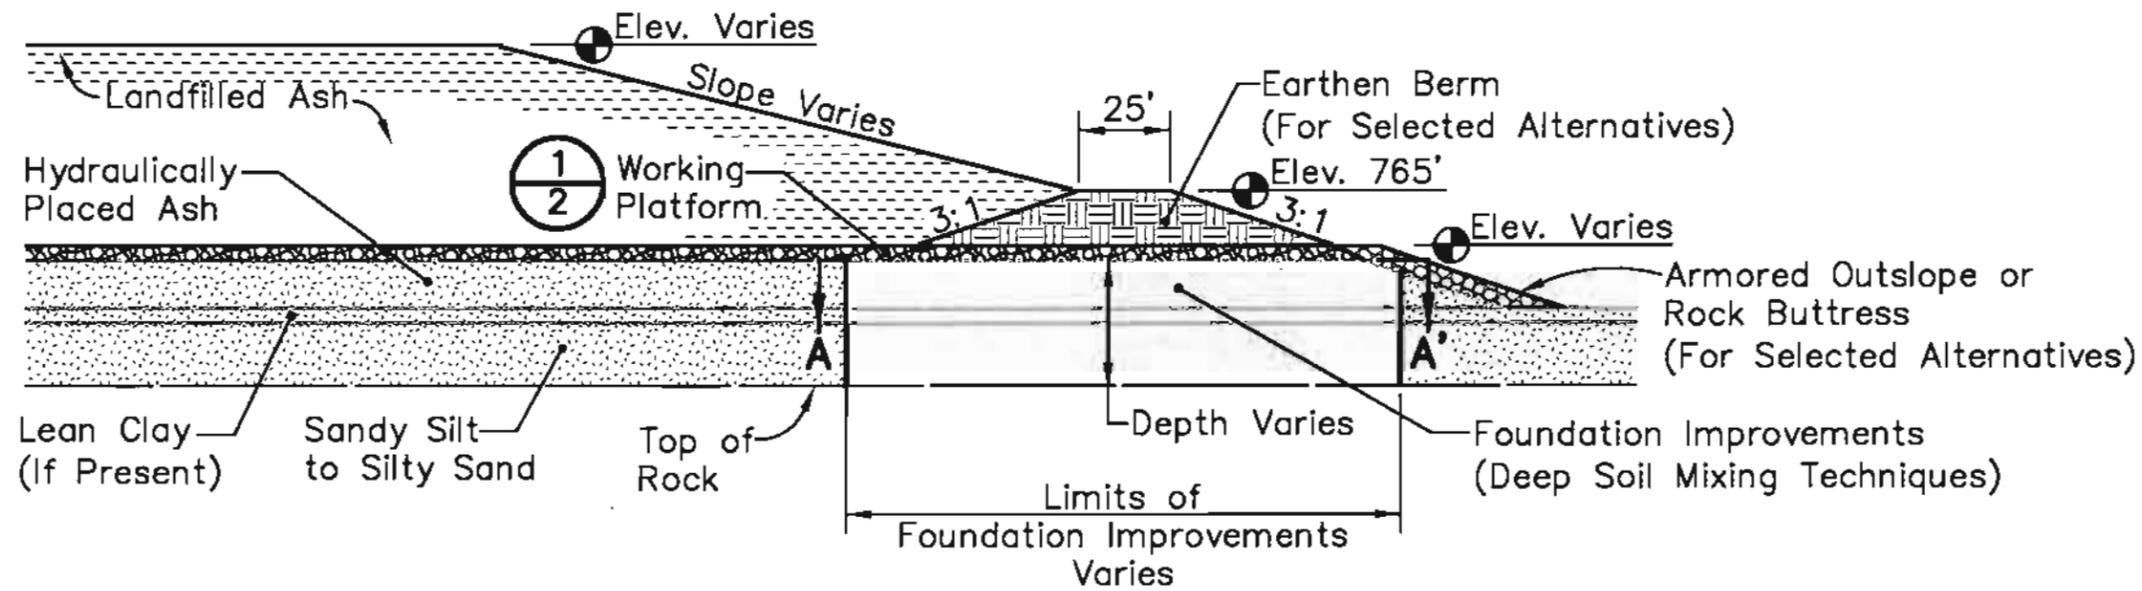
Alternative 5, Ash Pond East Divider Dike, With Improvement
